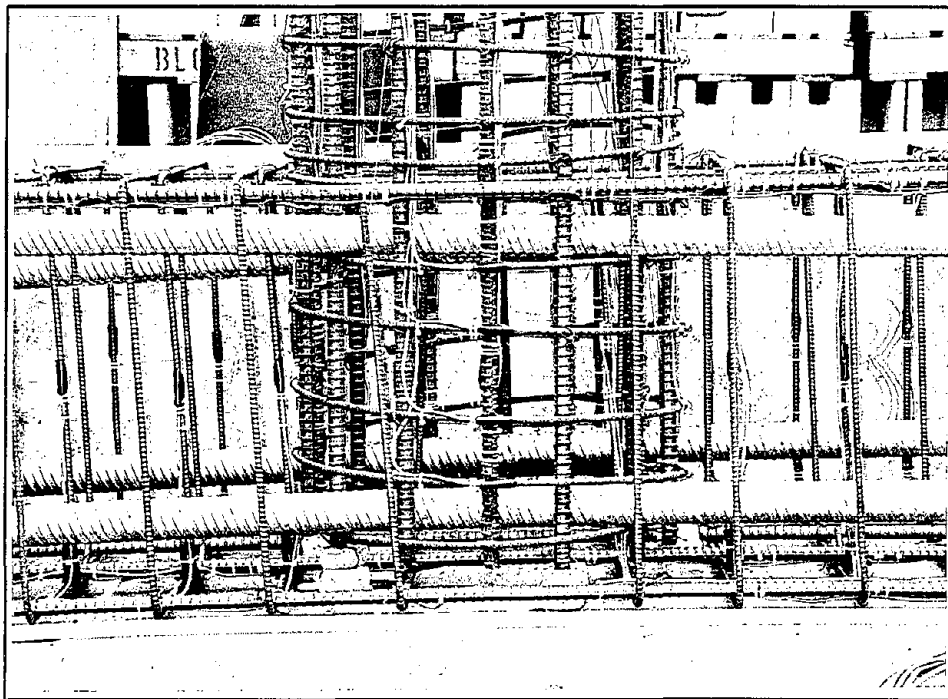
Joint reinforcement of test unit IC2 with a partially prestressed cap beam.
